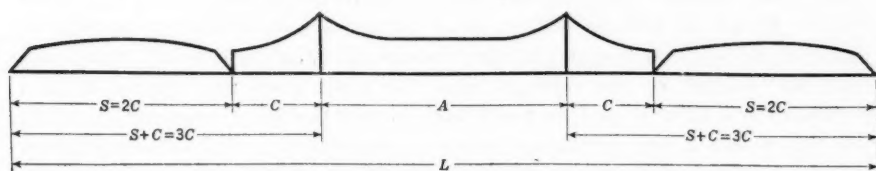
TYPE C CANTILEVER BRIDGE LAYOUT.
